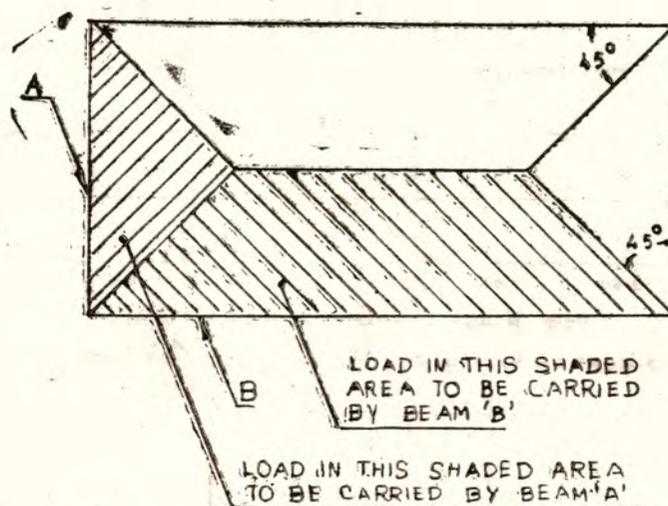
LOADS CARRIED BY SUPPORTING BEAMS
